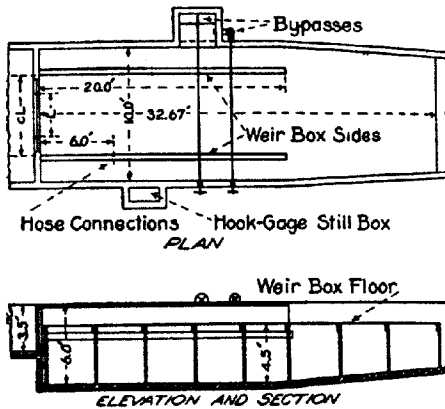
Plan, elevation, and section of concrete weir box in the hydraulic laboratory of the Colorado Experiment Station; also arrangement of experimental weir section for Nos. 1 to 6 and 13 to 16, in Table I.
